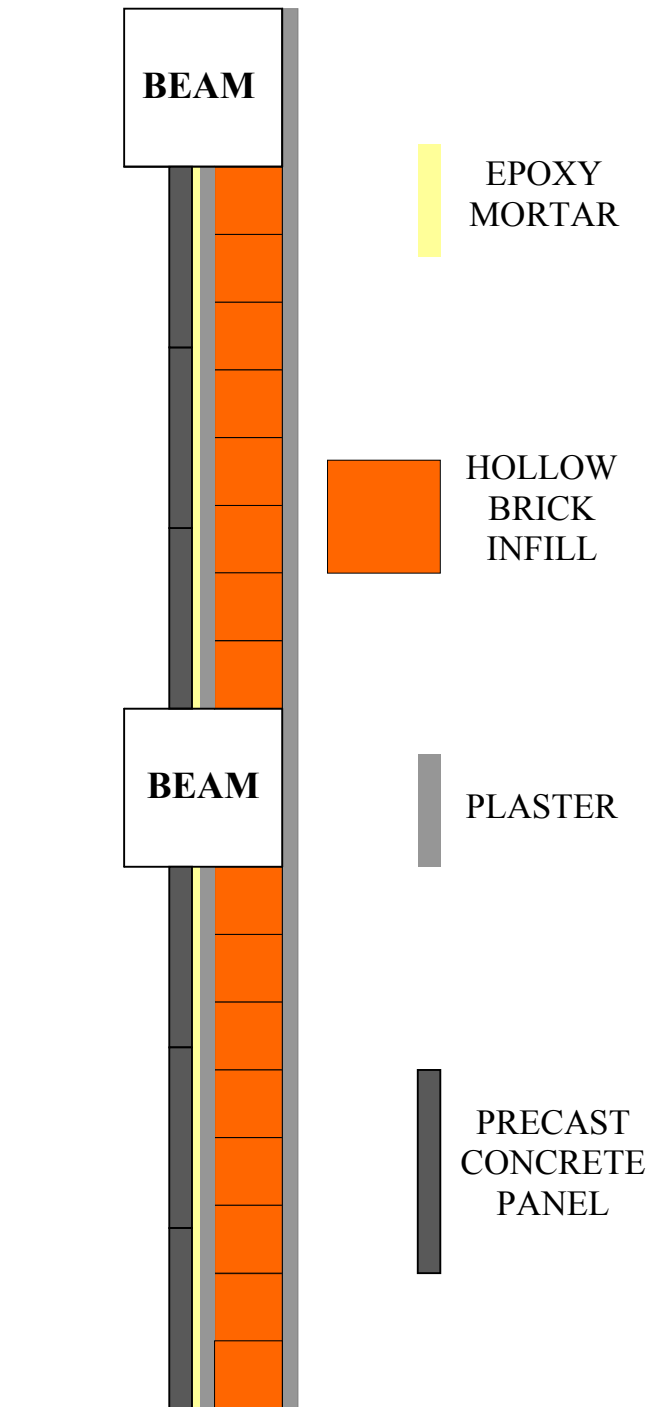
Detailing of precast concrete panel arrangement in vertical section
